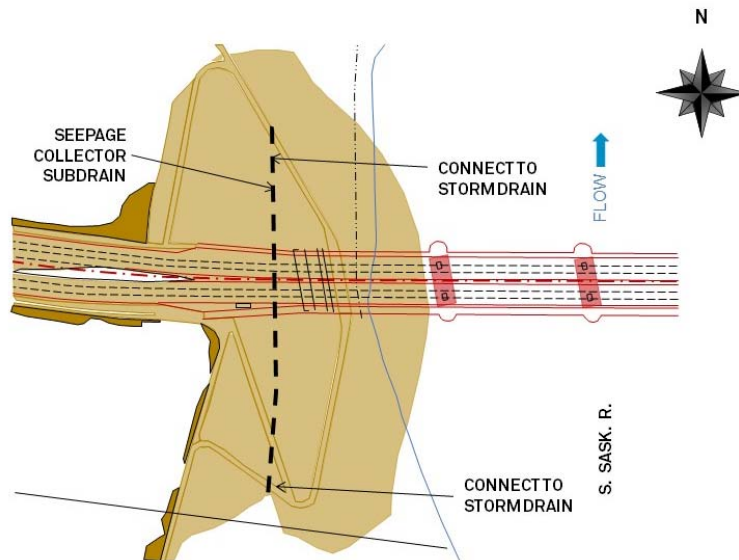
Conceptual plan of seepage collection and drainage system, north valley wall, North Commuter Parkway, Saskatoon, Canada.
